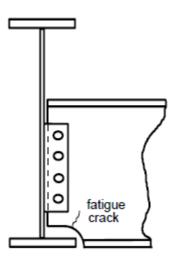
Bottom Flange of Floor Beam Coped at Connection to Girder
